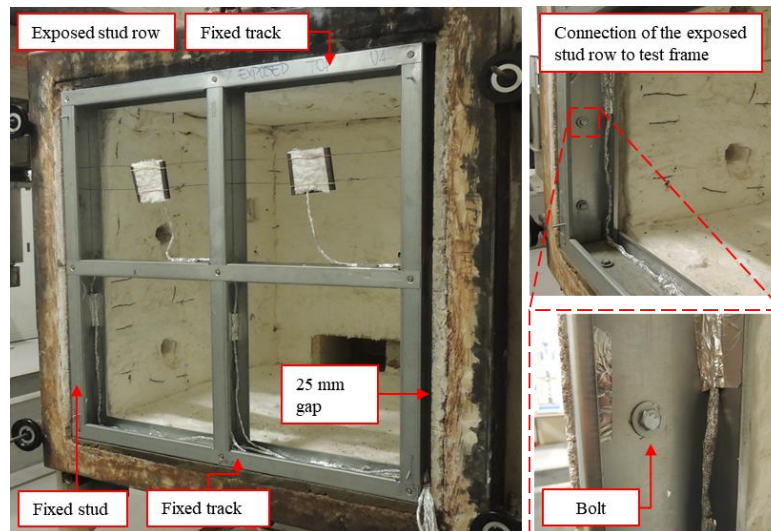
Connection of the exposed stud row to test frame (specimen 4).
